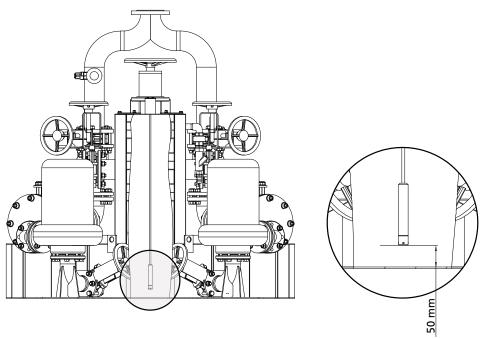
Installing the level sensor (example: AmaDS³ 02.10/2/01.11)
